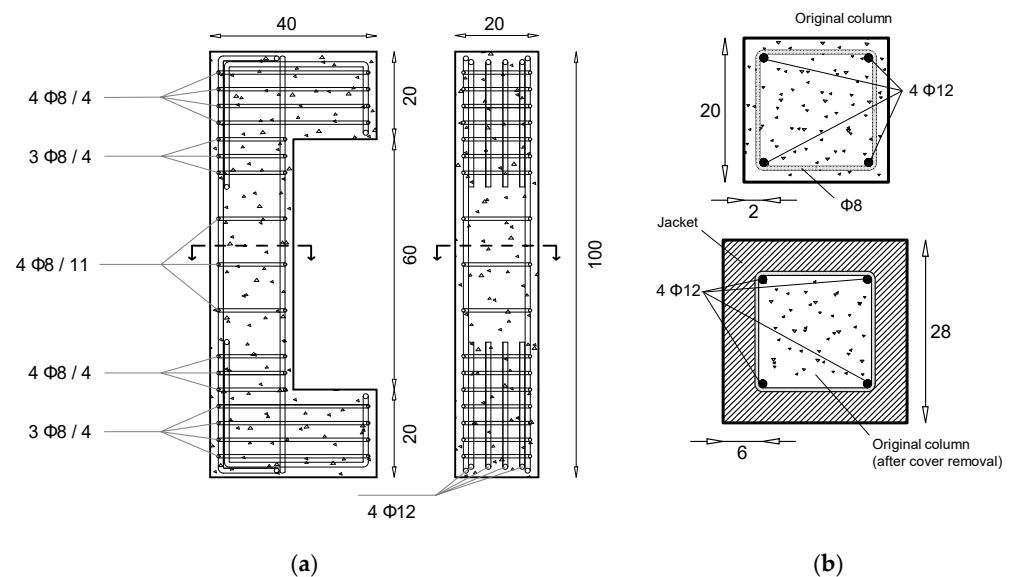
Geometry and reinforcement of the as-built specimens (a); details of the original and strengthened cross sections (b)—(dimensions in centimeters).
